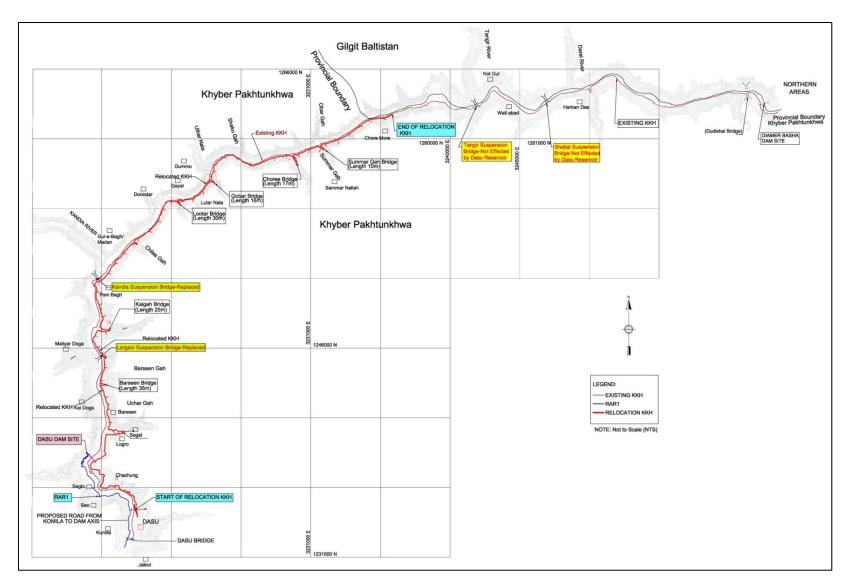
Proposed Relocation Plan of KKH and Right Bank Access Road Komela to Dam Site and to Kandia
